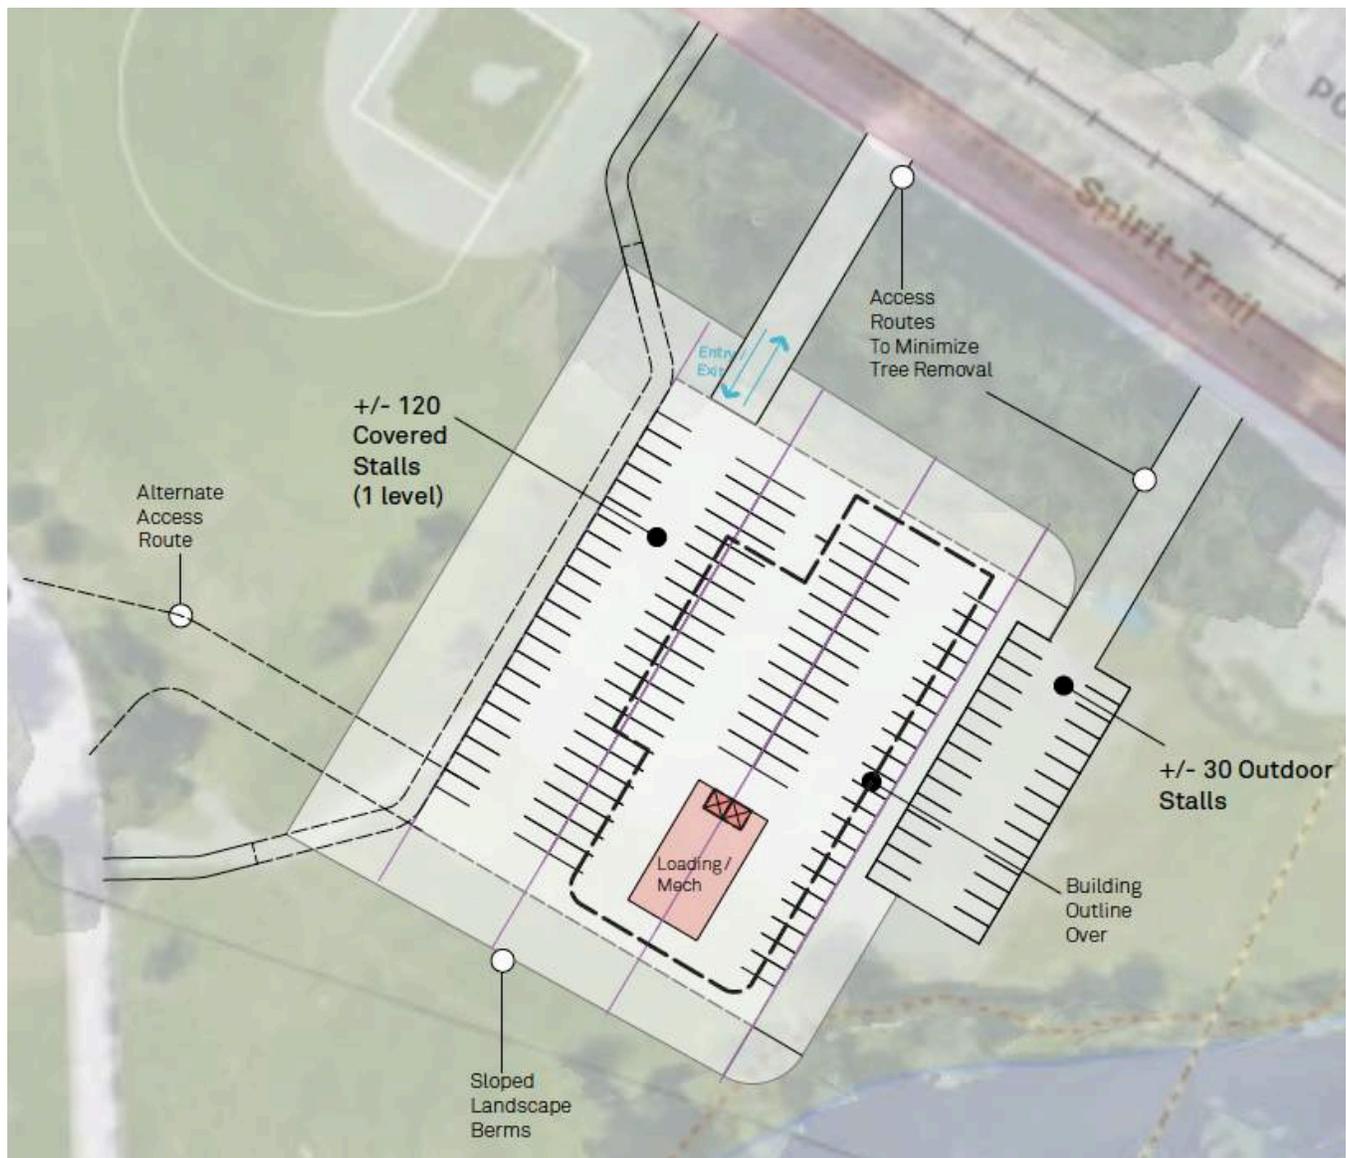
Ambleside Park – H-Field: Possible site configuration – Plan view
